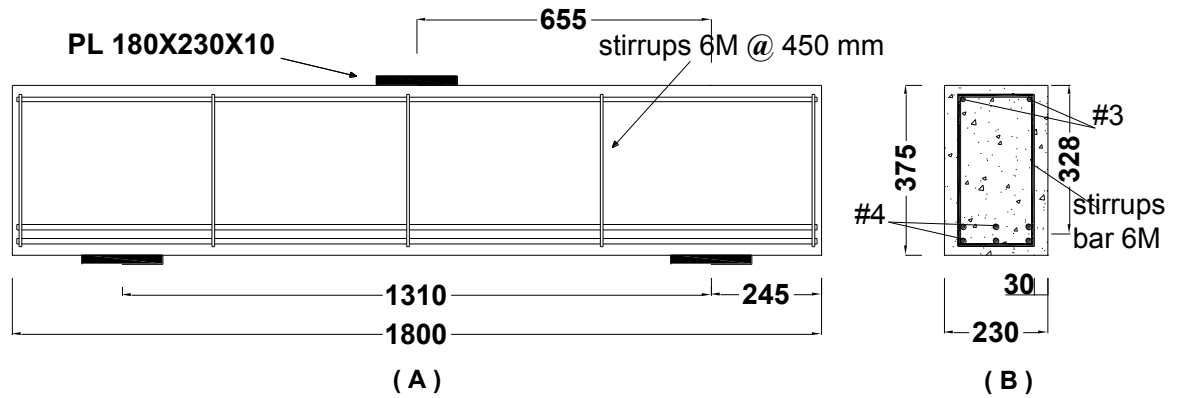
Beam C2/50: (A) elevation (B) cross section
